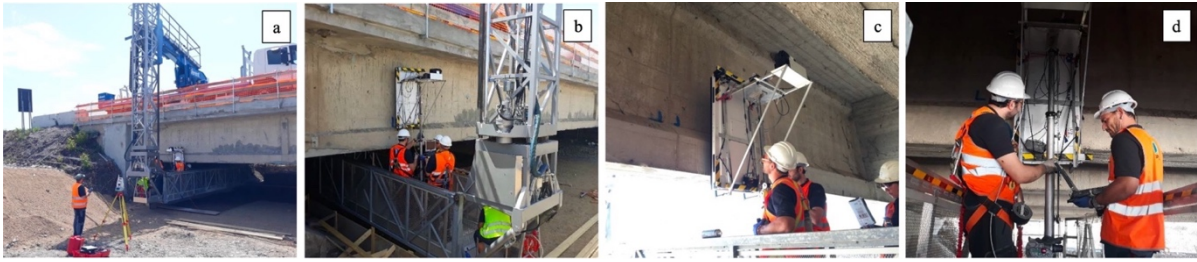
Inspectors performing GPR on: (a and b) the girder's web; (c and d) the girder's lower flange.
